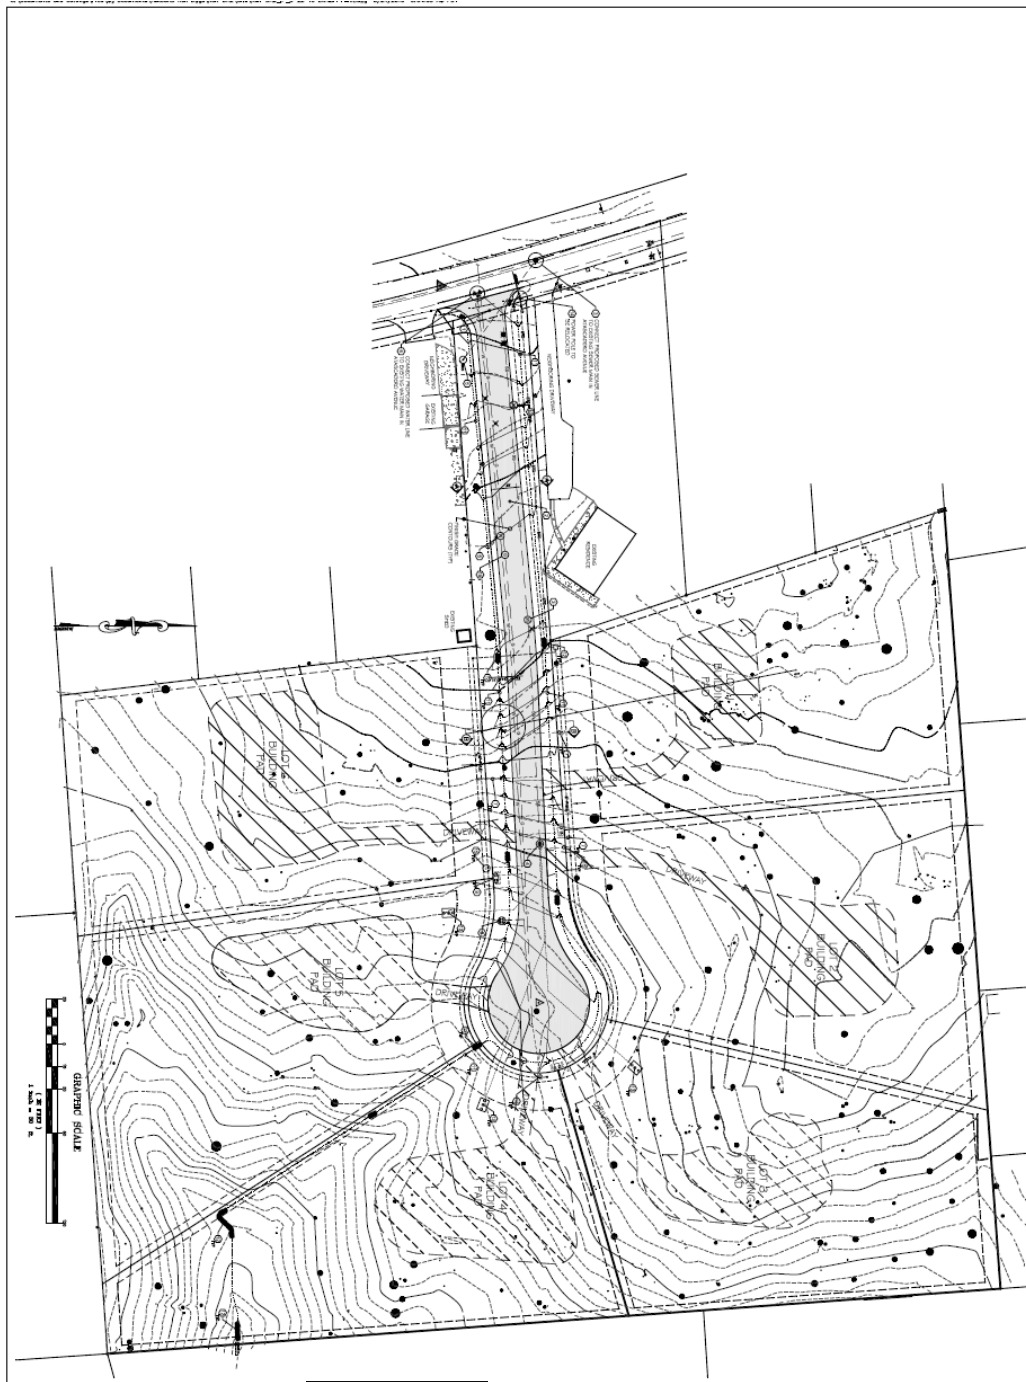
EXHIBIT E: Building Envelopes Exhibit – Tract 3147
